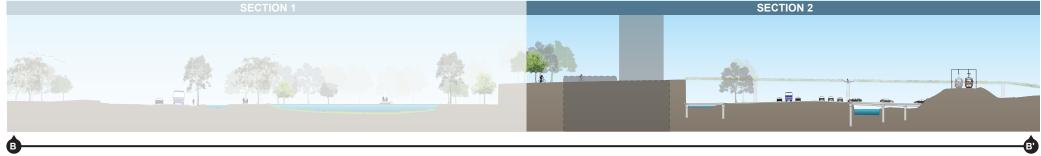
Long-section of the Rozelle Rail Yards - north-south - section 1
